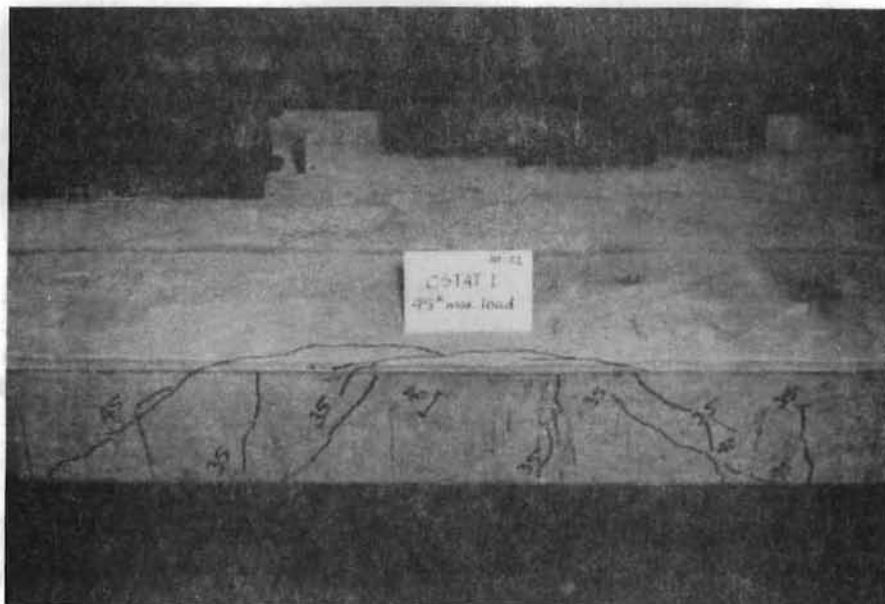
Inclined slab cracking (after removal of cast-in-place barrier): CSTAT1
